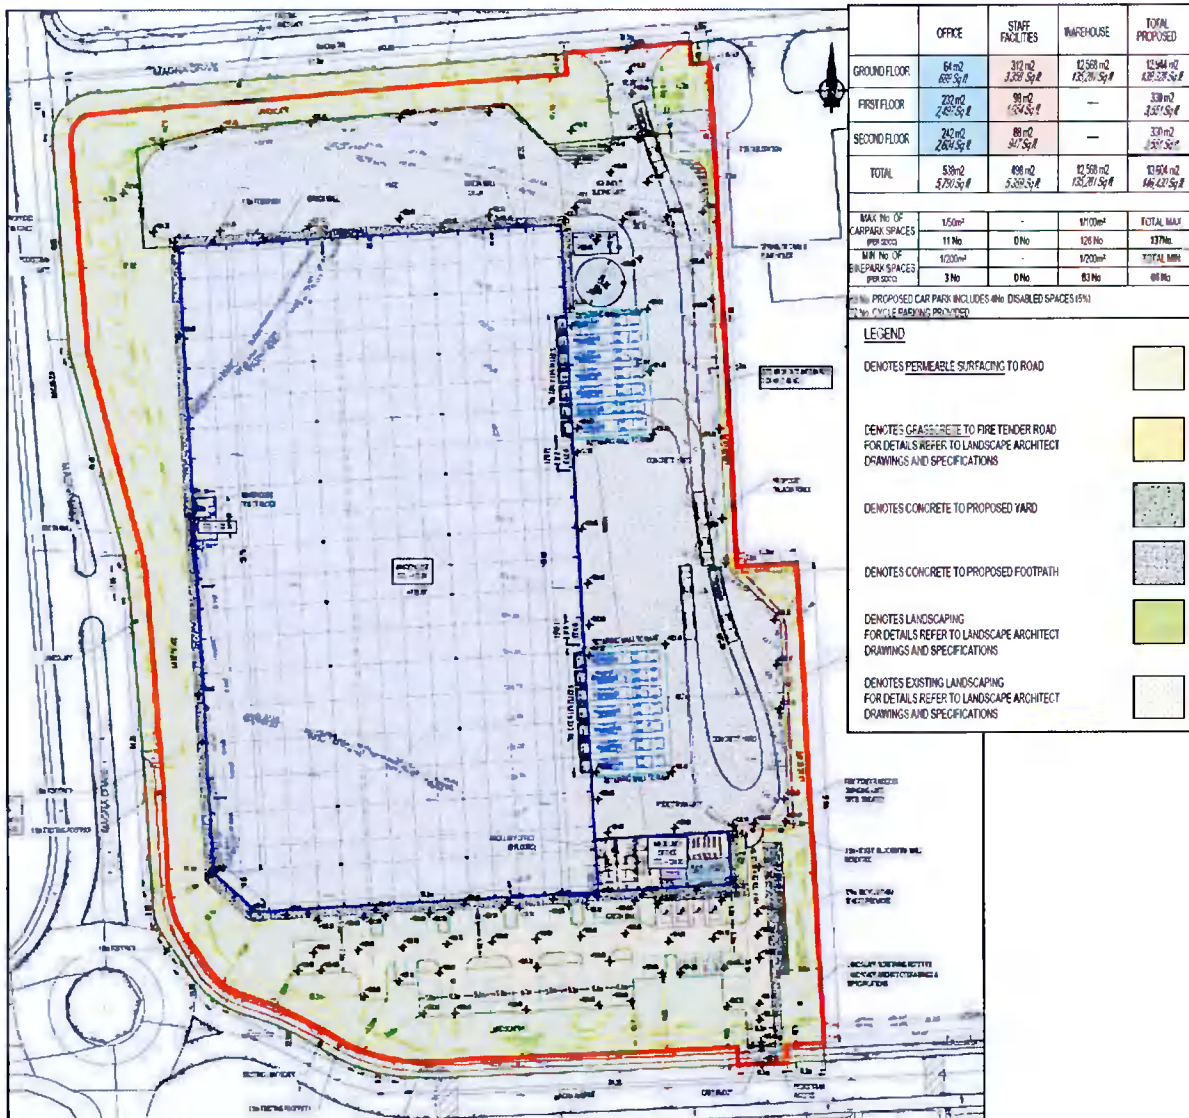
Proposed Site Layout Plan, Drawing No. D1720-D2-PL1
